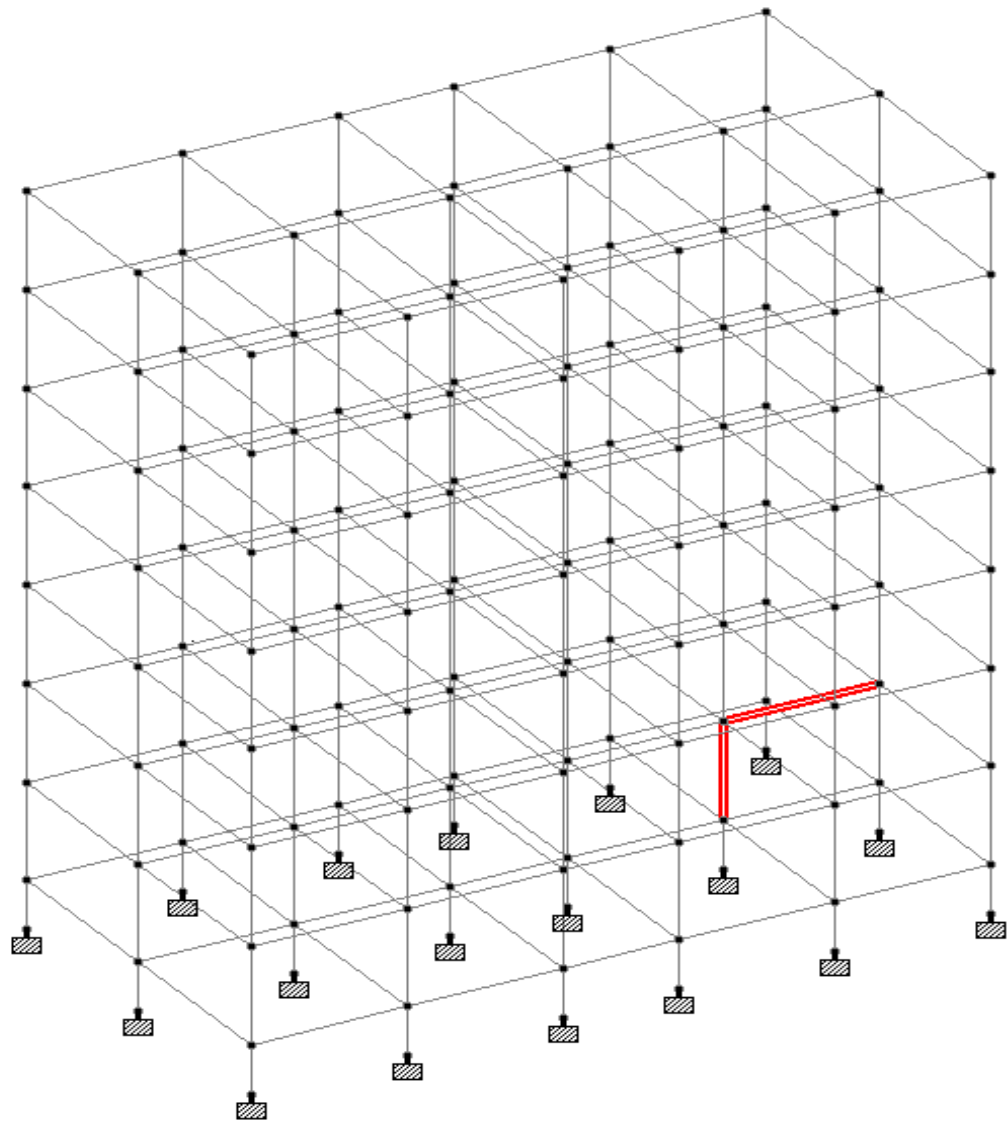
3-d view of the building model, highlighted members indicate the ones which have been considered for detailing.
